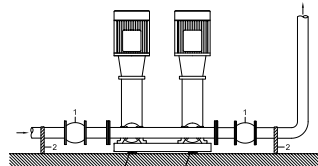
Example showing the position of expansion joints, pipe supports and machine shoes
